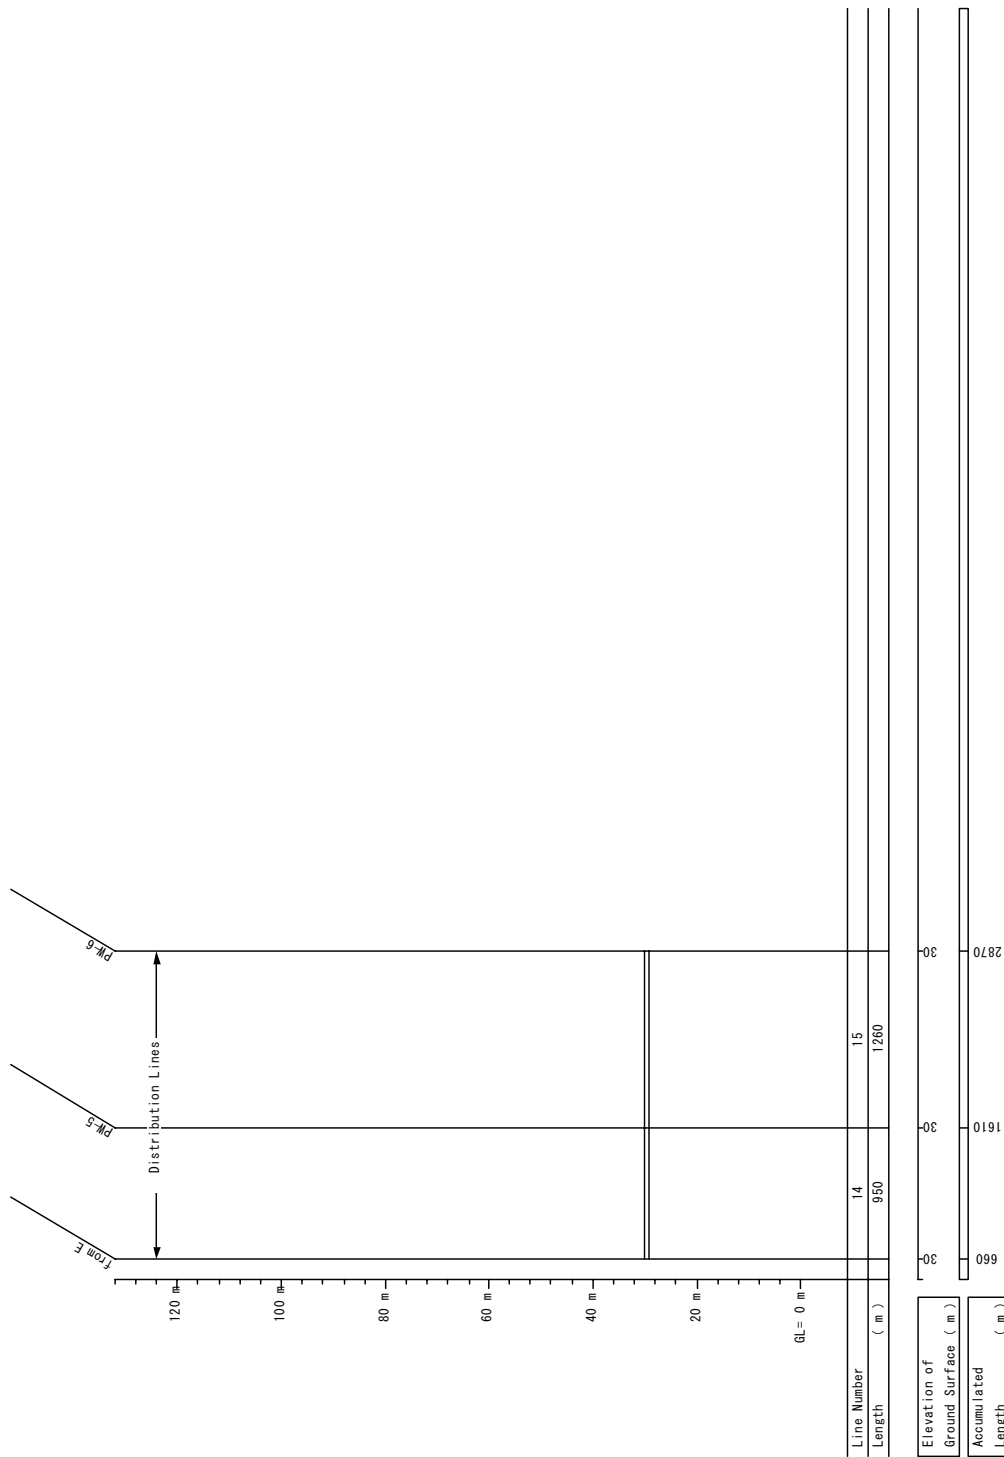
LONGITUDINAL SECTION ( KITUNDA-KIVULE-2: 14/22)
